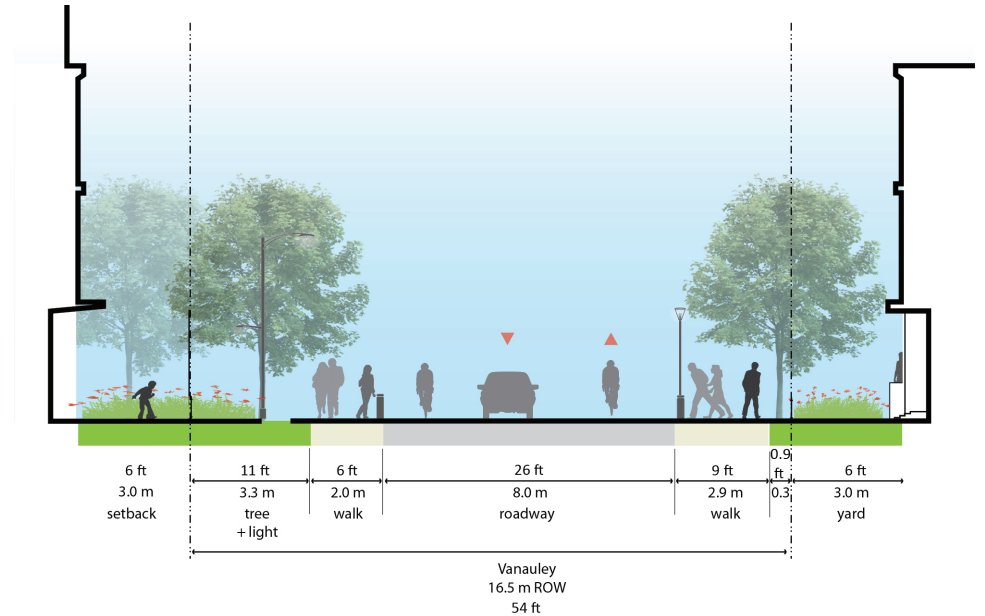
Section b-b: Vanauley Street 16.5 m ROW
